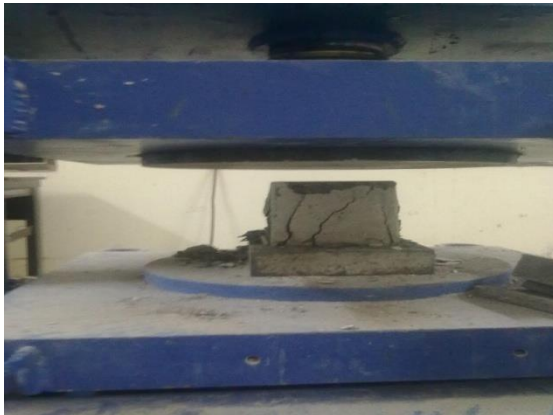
VIEW SHOWS THE CUBE COMPRESSIVE STRENGTH TEST AFTER TESTING
